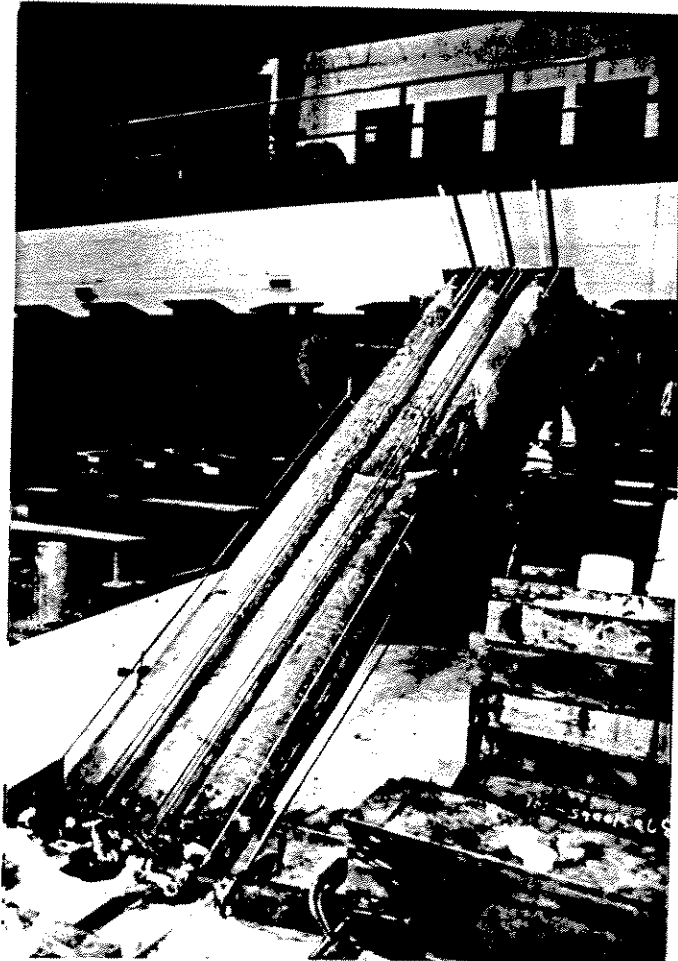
Inclined Set-up for Internal Grouting of Repaired Specimens
